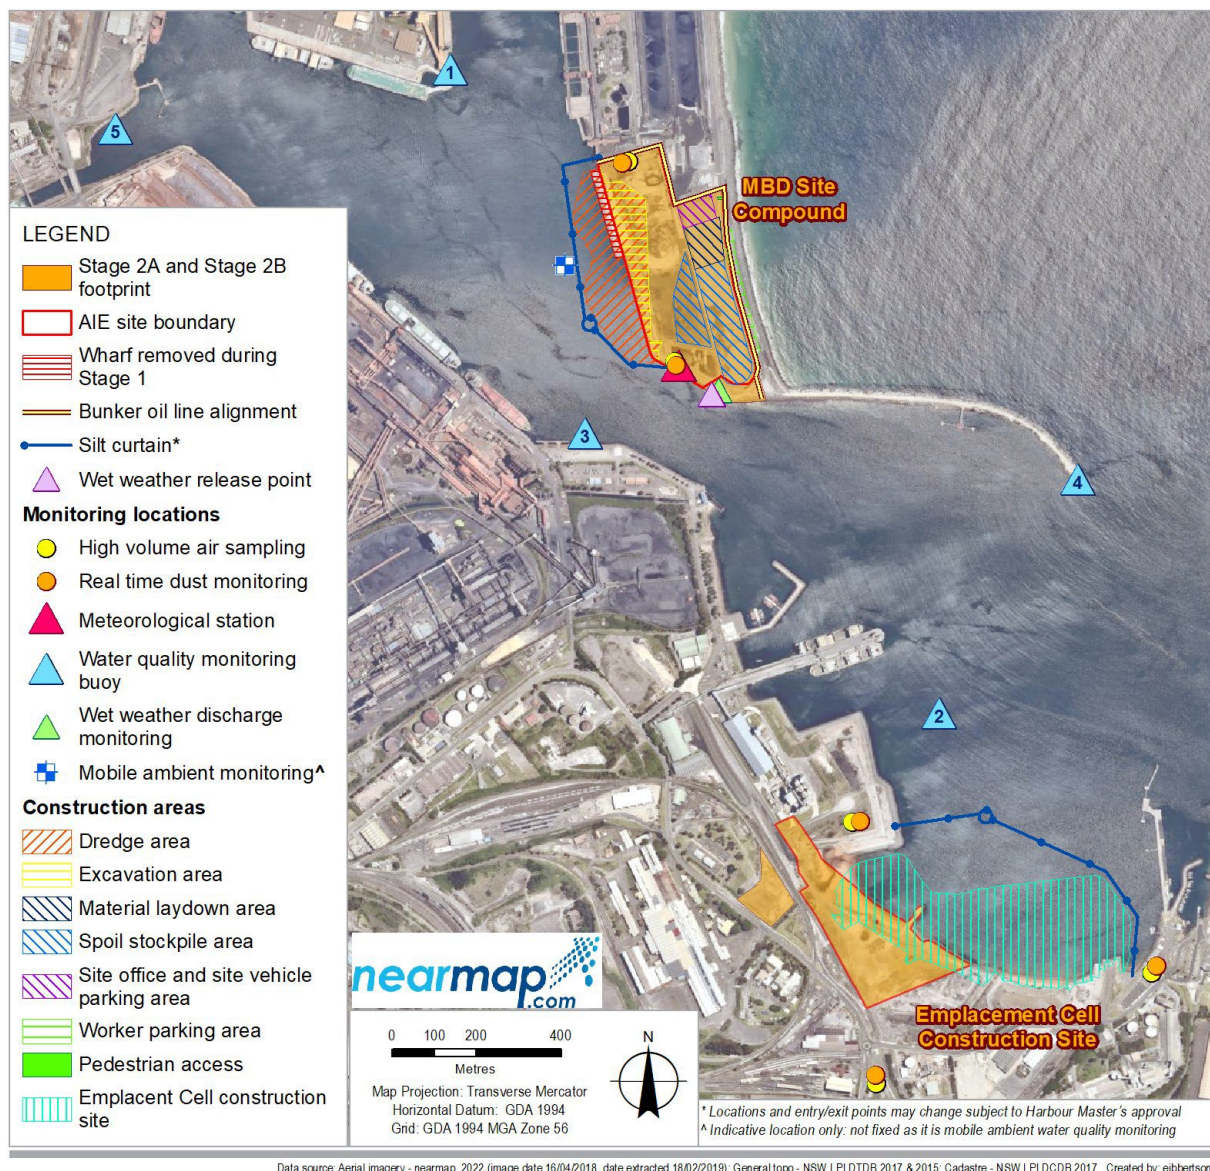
Stage 2A and Stage 2B works and location of MBD Site Compound, Emplacement Cell and Emplacement Cell Construction Site
